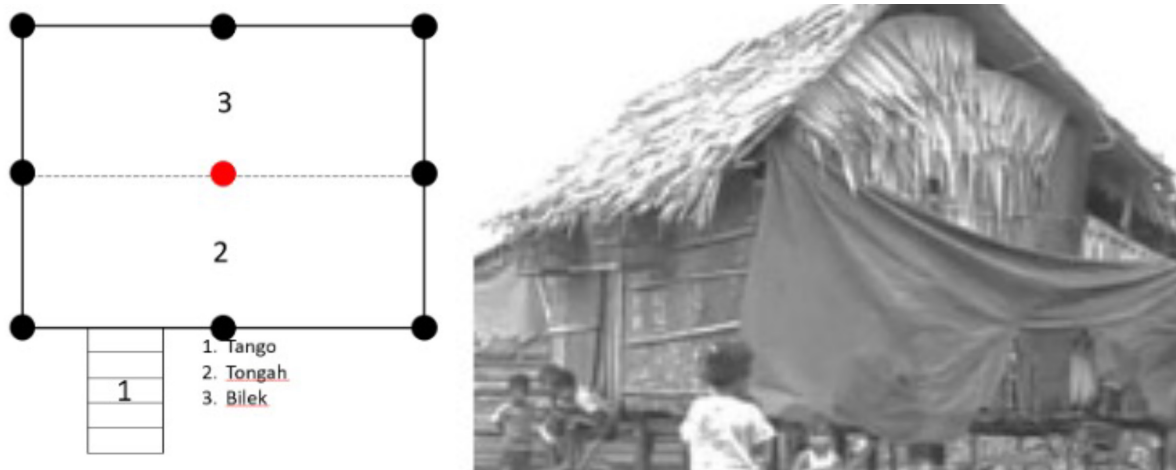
The Floorplan and its House of Sakai People (Source: Khamdevi 2017-2020)
